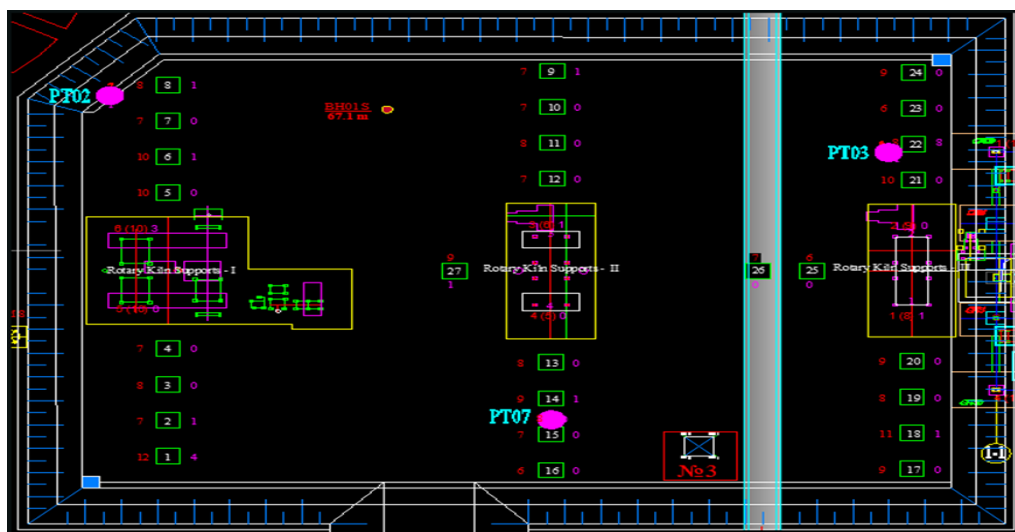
Scheme of unloading the soil mass from the embankment and placement of test piles
